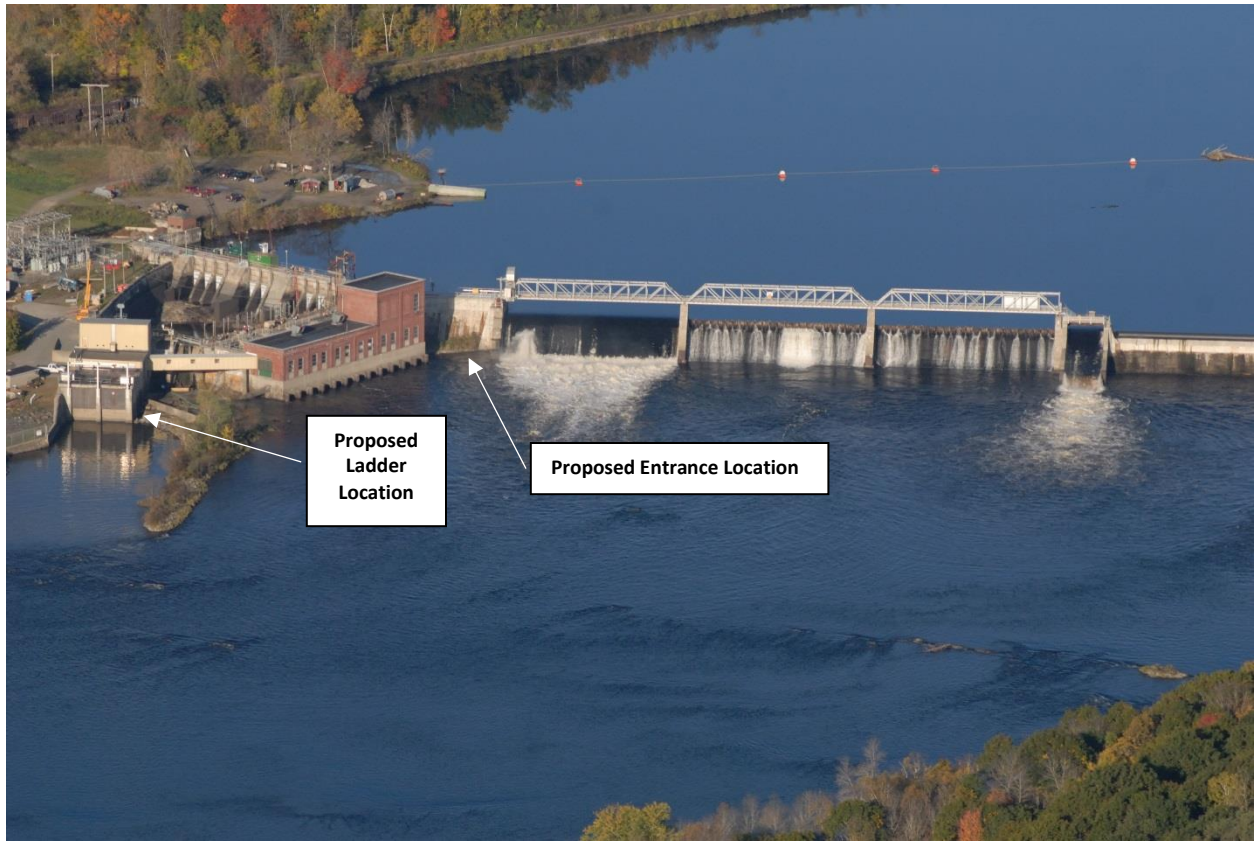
PROPOSED ENTRANCE LOCATION TO UPSTREAM FISH PASSAGE FACILITY AND FISH LADDER (PHOTO DATE: 10/12/09)
